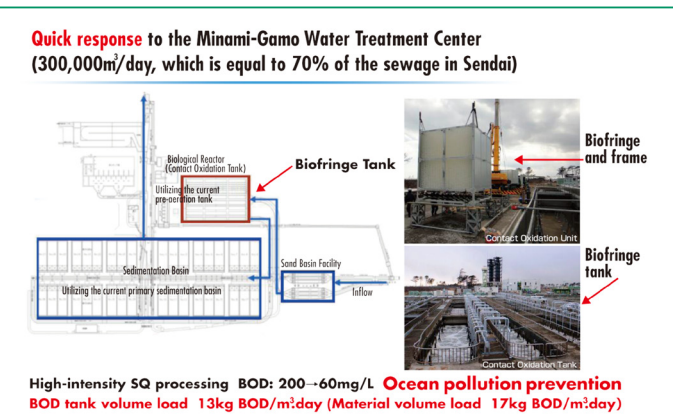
Emergency Plan for Great East Japan Earthquake/Tsunami Restoration (Minami-Gamo Water Treatment Center in Sendai)
